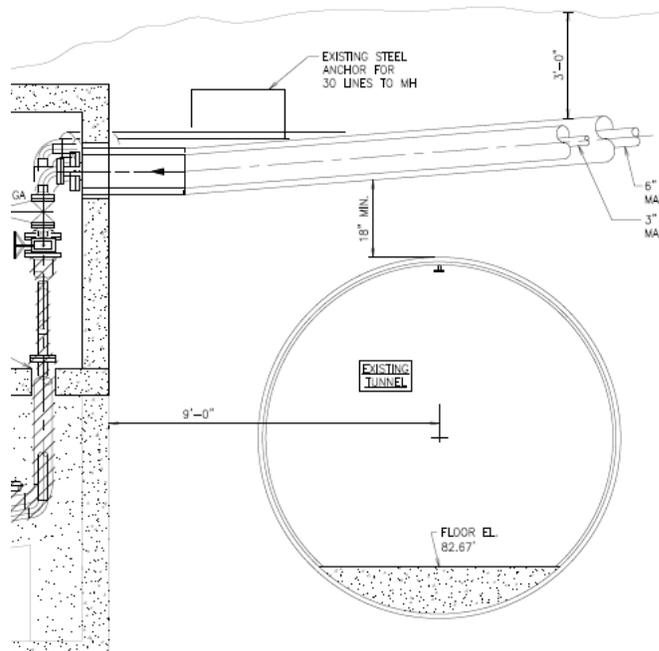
Elevation view of the TtB tunnel and the steam pit.
